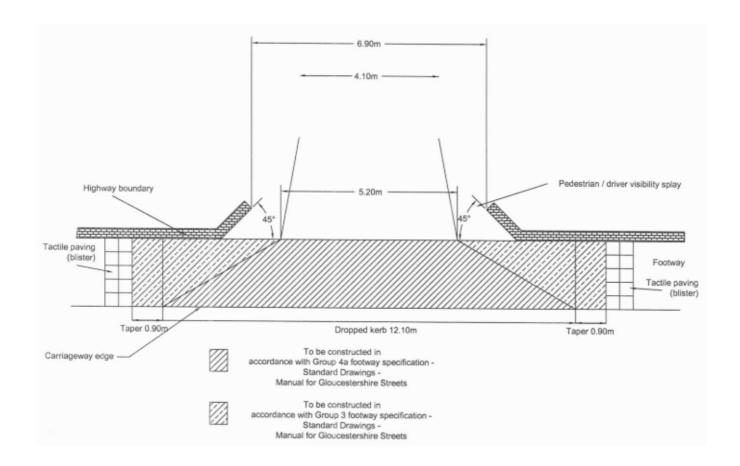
Standard access to 2 to 5 dwellings over footway (only to be used on Class 4 highway or below).
